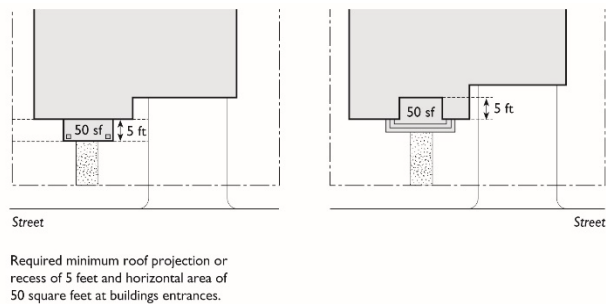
B(1): BUILDING ENTRANCE PROJECTION OR RECESS
